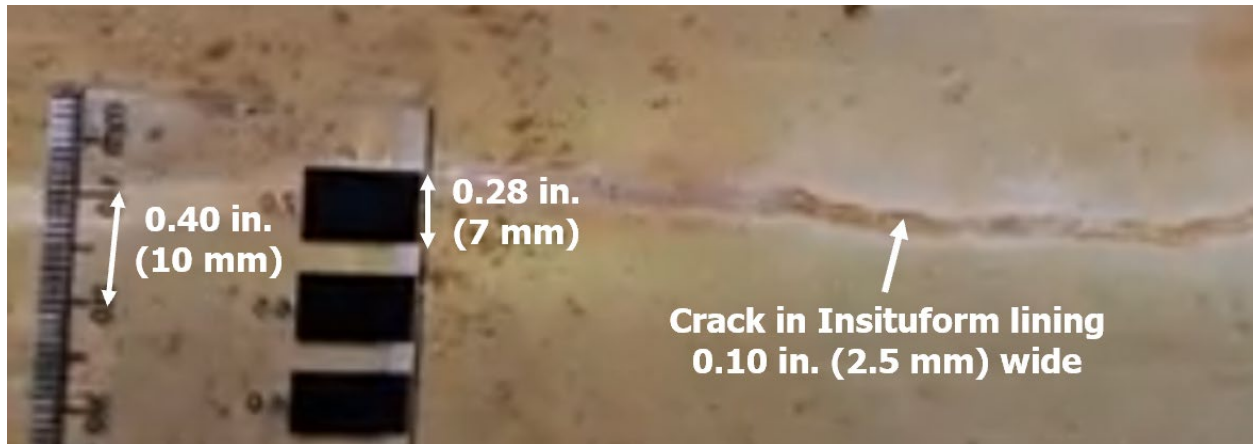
Photo of crack in I-Main lining at invert of pipeline specimen
